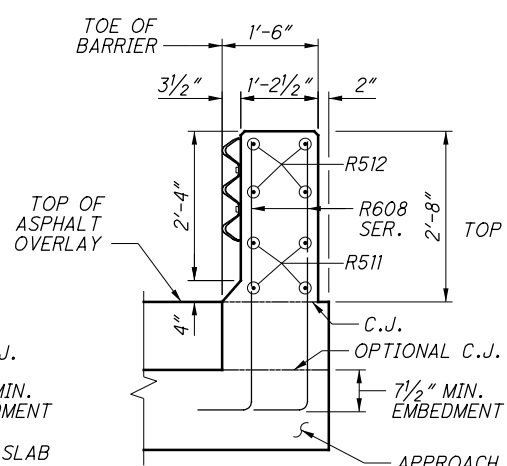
DETAIL A - REINFORCING LAYOUT ALONG PHASE C-J
